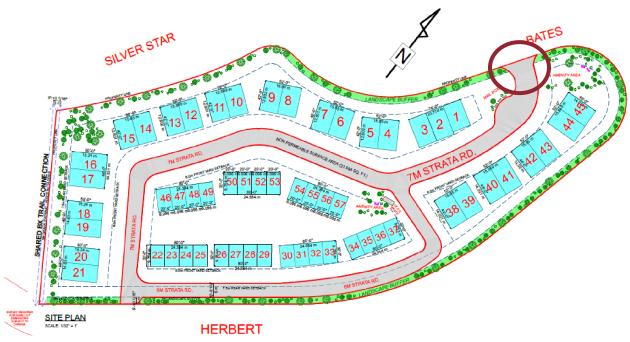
7025 Herbert Rd Site Plan & Access to Bates Rd
